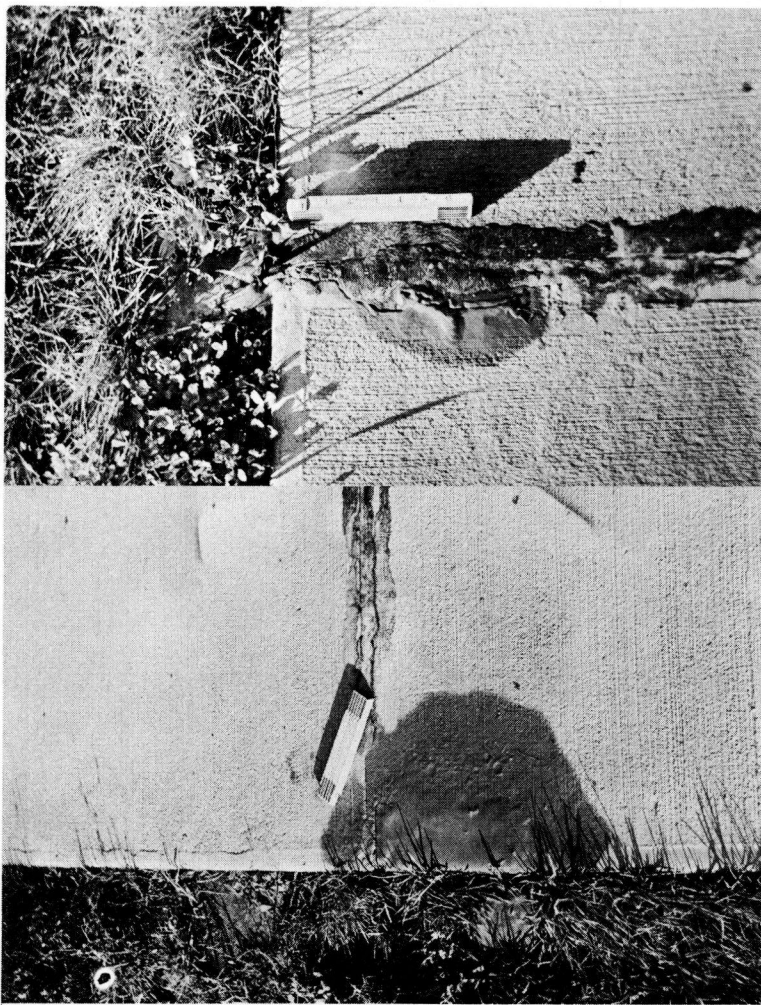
Sediment has been pumped onto pavement at contraction joints in sections having plain concrete, 15-foot joint spacing and no subbase (type I pumping). At top is Station 454+52; at bottom, Station 454+07.
